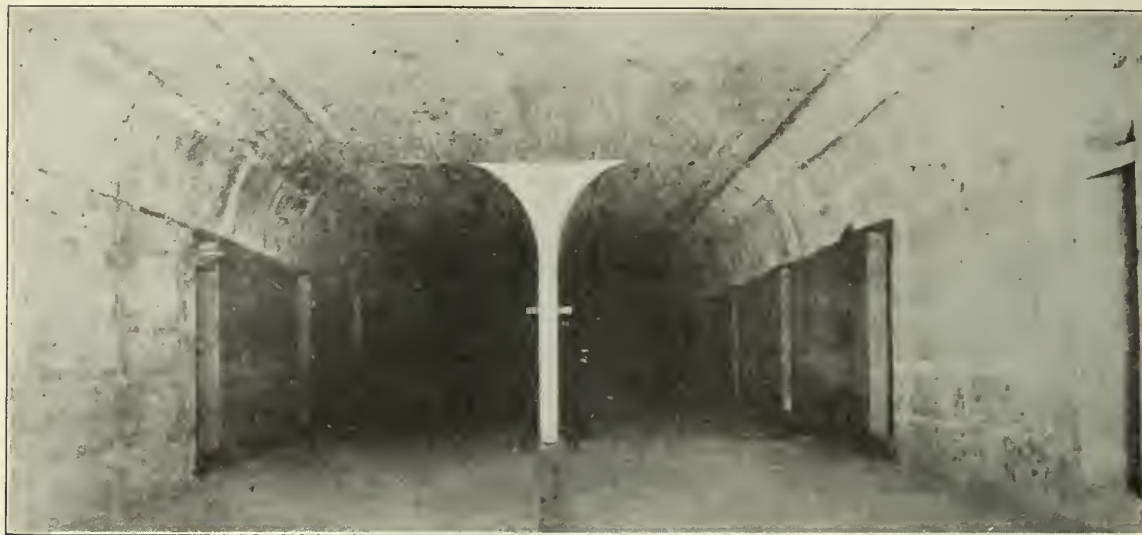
Boylston Street Subway, Section 3. Station 29x50, Looking West.
